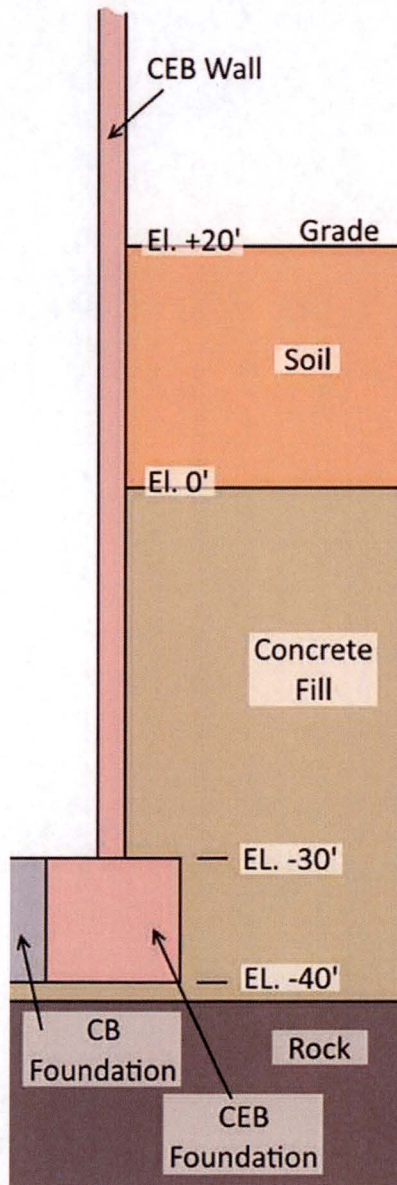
Concrete Fill and Soil on Exterior of CEB Wall (Not to Scale)
